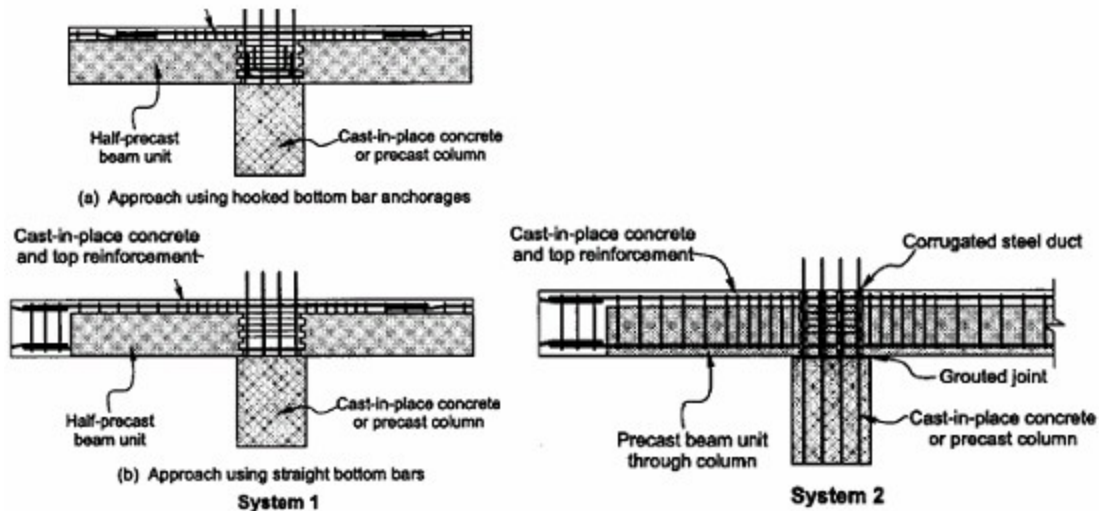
Ductile equivalent monolithic R/C moment resisting frame system, system 1 and system 2
